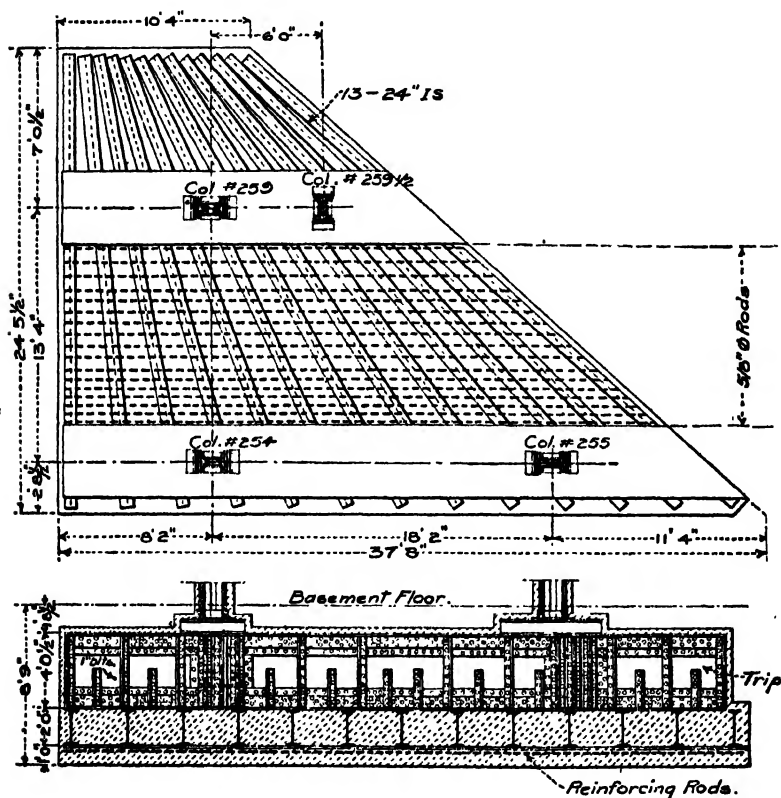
Special Footing for Four Columns, Curtis Building, Philadelphia.
